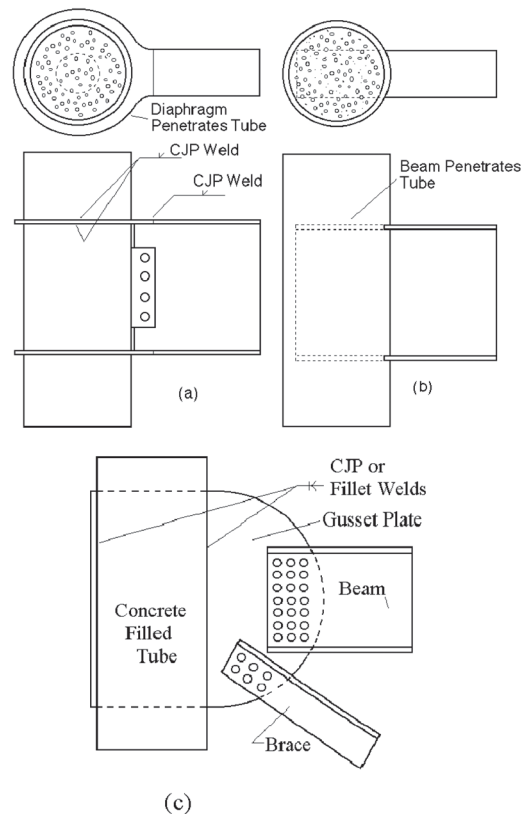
Penetrating CFT connections: (a) internal diaphragm connection; (b) penetrating beam connection; (c) penetrating braced-frame gusset plate connection.
